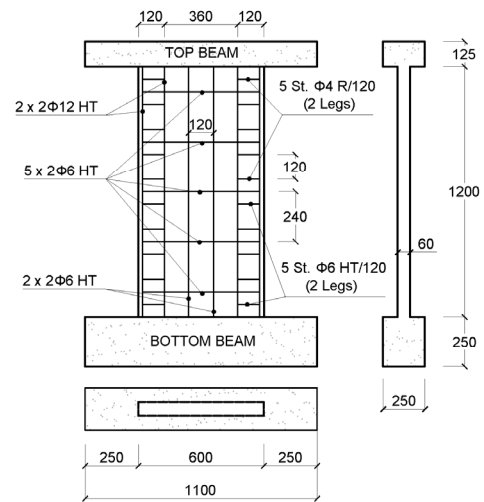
Geometry and reinforcement details of wall SW4 / Geometria e dettagli delle armature per il muro SW4.
